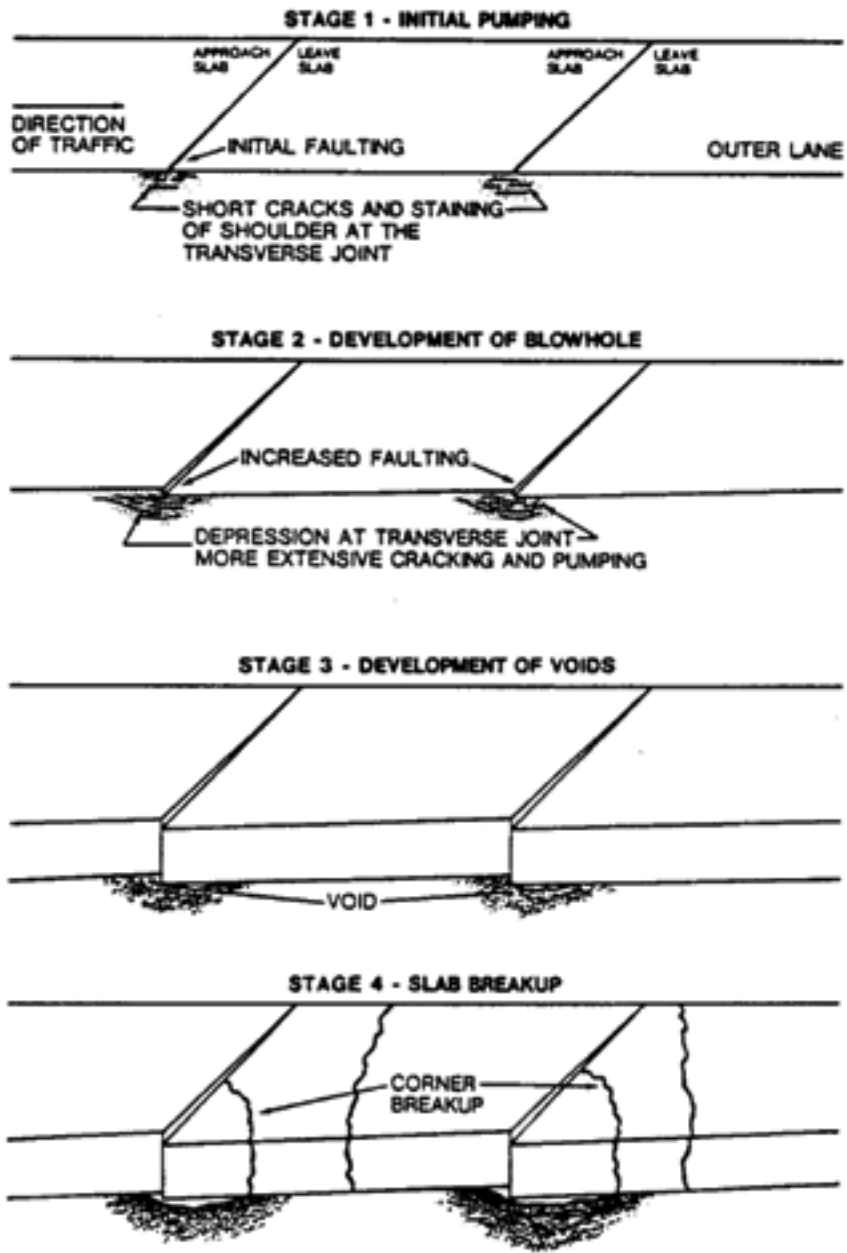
Typical stages in the deterioration of a concrete pavement (Darter, Barenberg, and Yrjanson 1985)
